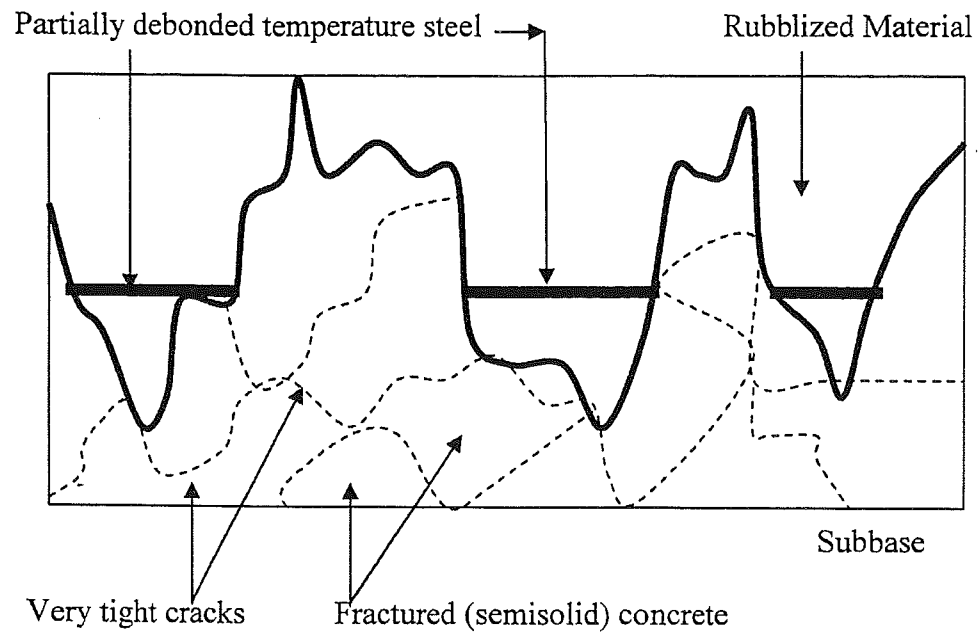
Schematic of rubblized concrete slab showing rubblized and fractured layers
